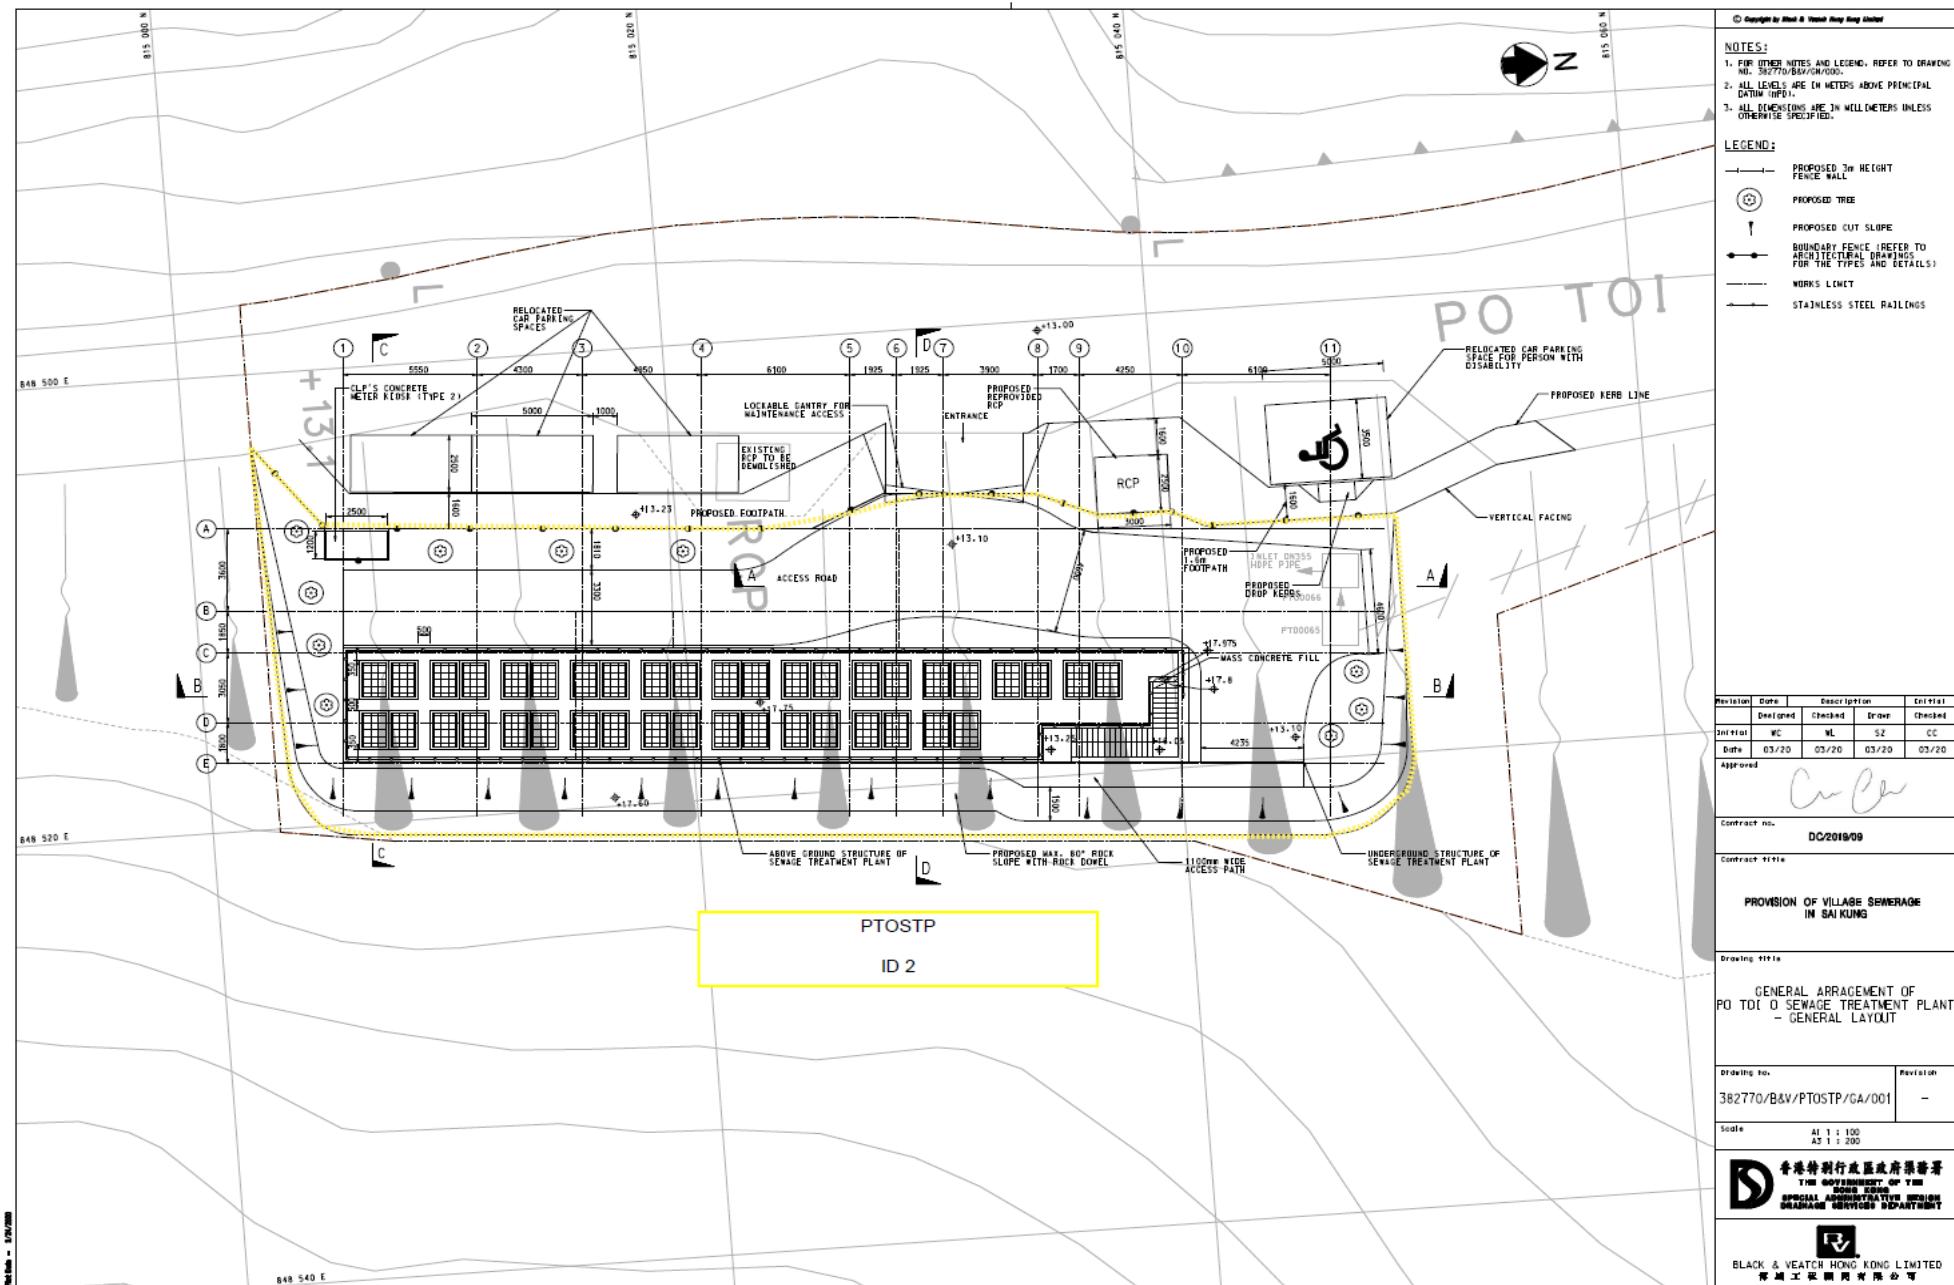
LAYOUT PLAN OF THE CAPTIONED PROJECT
